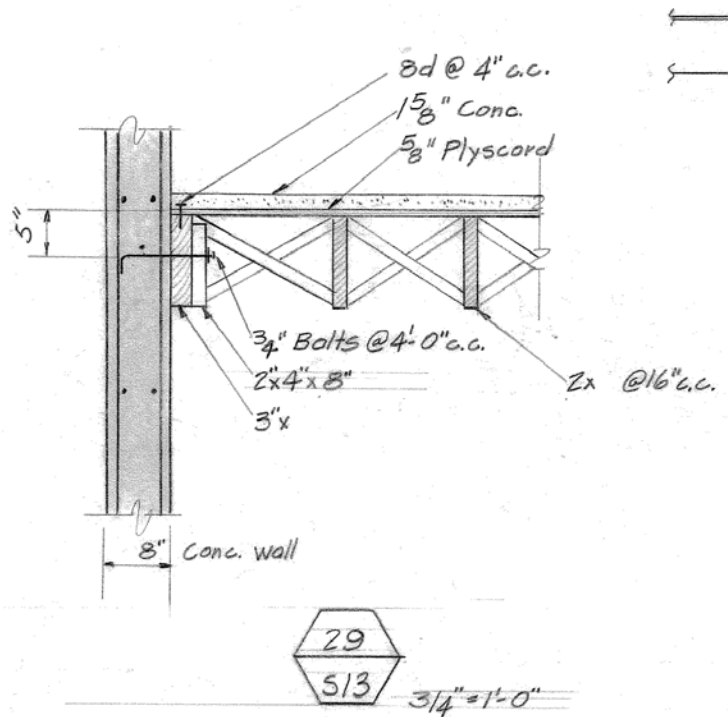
Second Floor Diaphragm to Concrete Wall Detail 29/S13 (Joists Parallel to Concrete Shear Wall)
